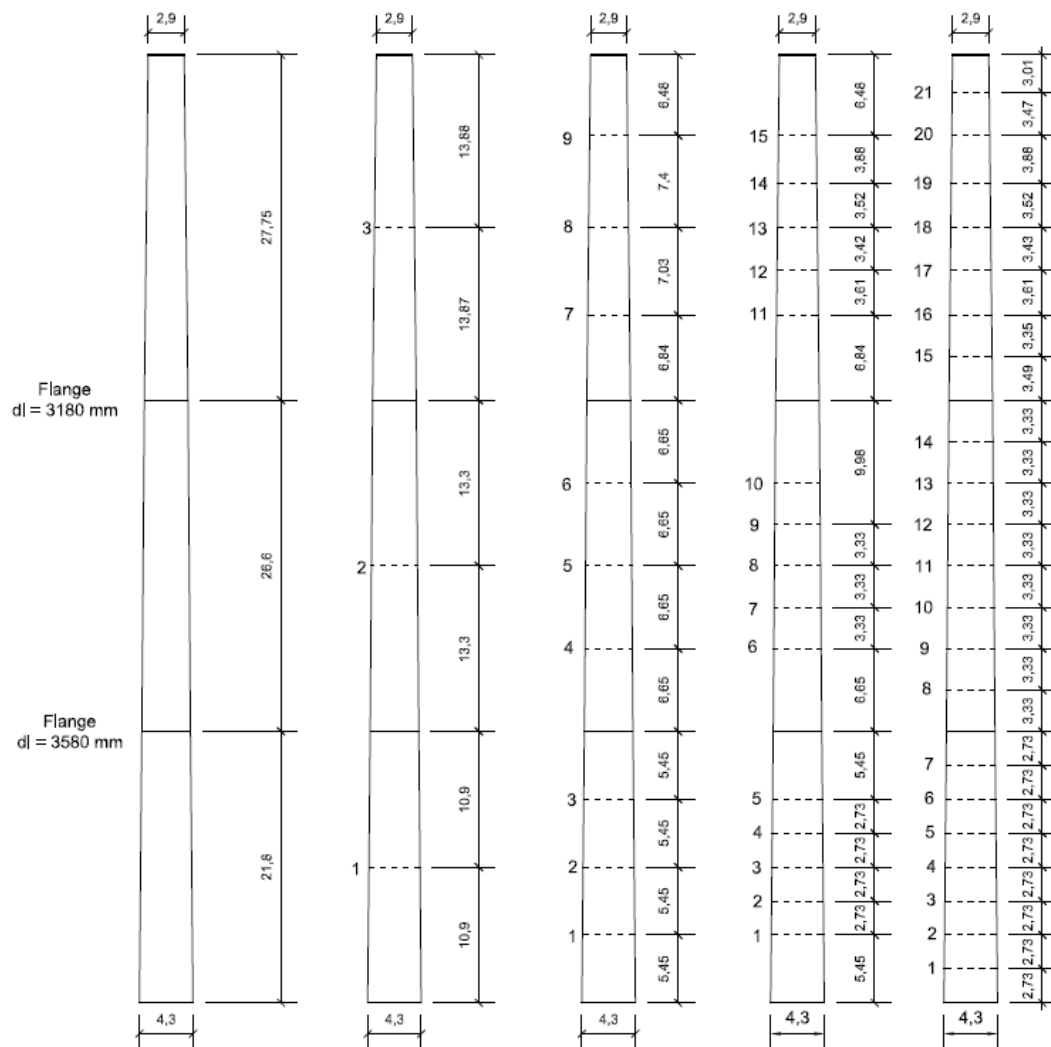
Details, dimensions and spacing of stiffening rings in the different configurations
